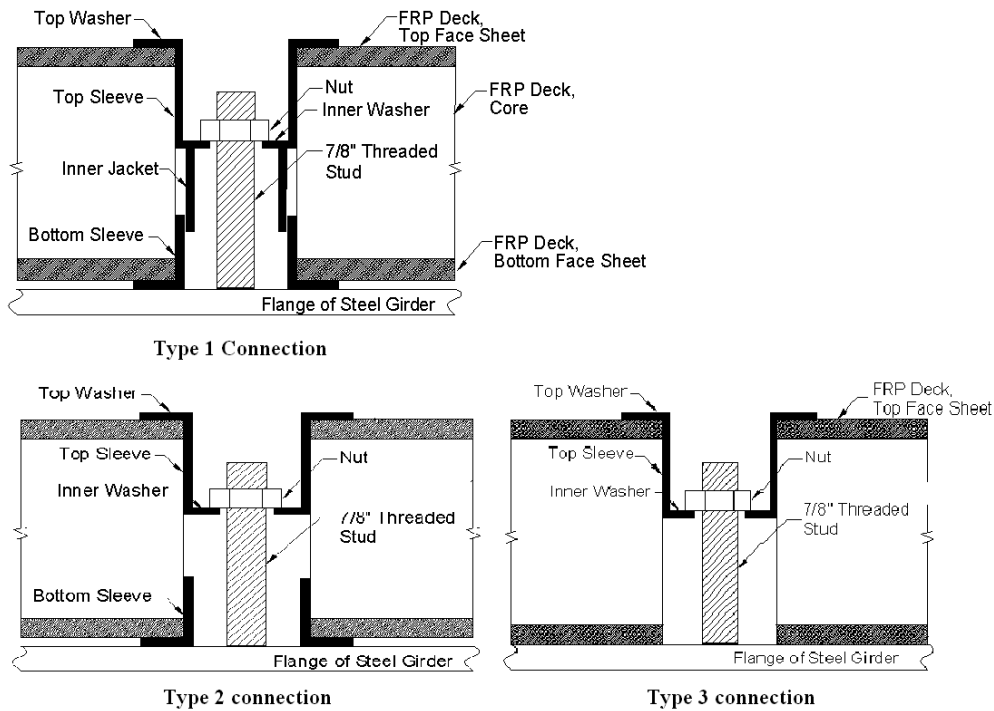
Configuration of FRP deck to girder different type connections developed by (Righman, 2002)
